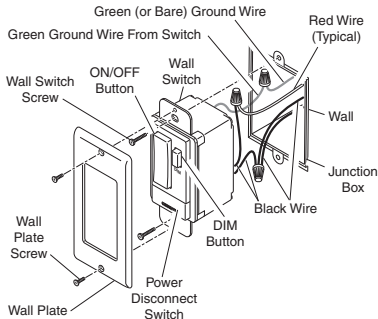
Installing 3-Way Wall Switch (Transmitter Shown)
